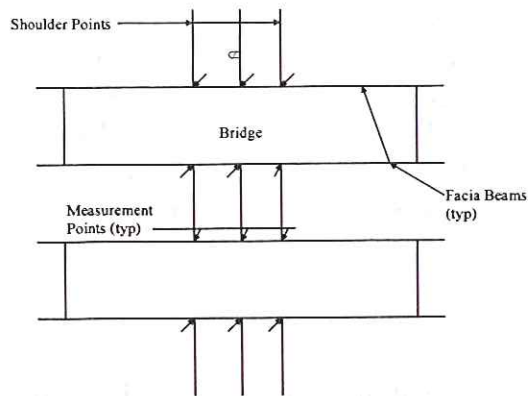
Bridge Underpass for Projects under existing structure(s)
